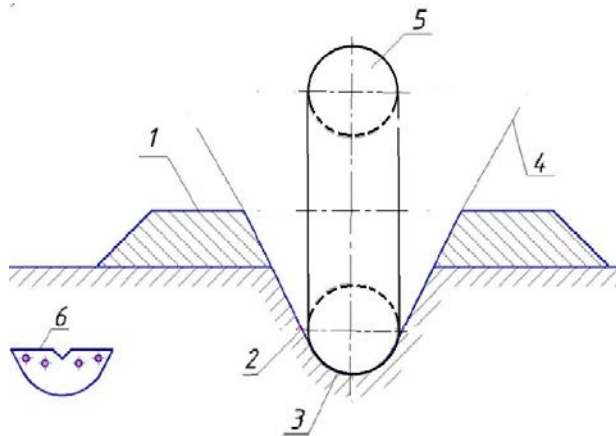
The proposed cross-sectional shape of the proposed excavator which excavats furrow: 1-cavalry; 2 - side and 3 bottom part; 4 - parabola; 5 - base wheel;6-parabola-shaped blade (lemex).
